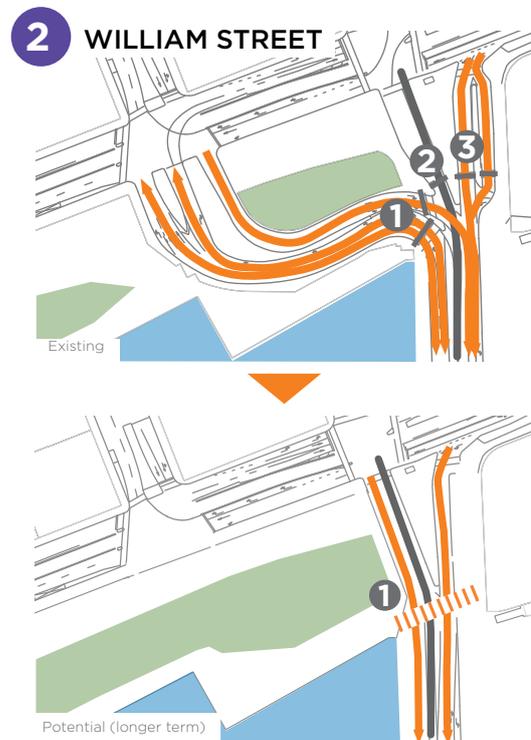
Williams Street existing conditions with multiple crossing stages and potential major transformation to simplify the arrangement.
